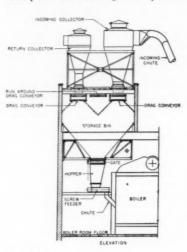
ARRANGEMENT OF HORIZONTAL BIN SYSTEM
